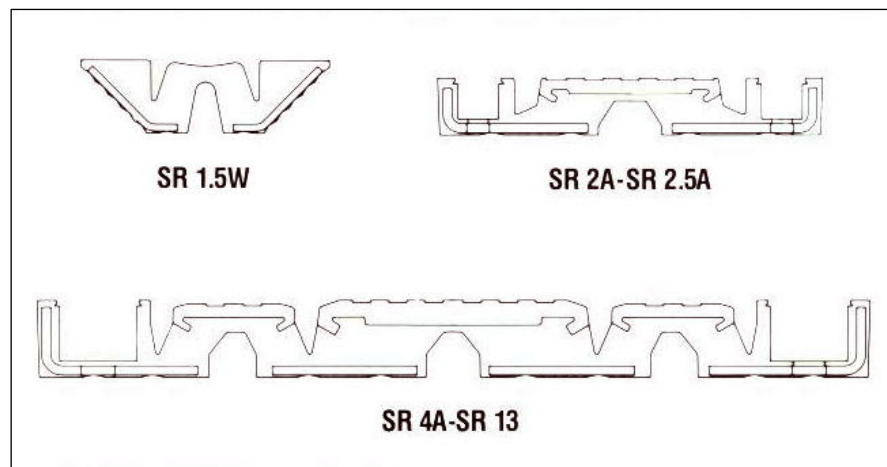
Molded Segmental Expansion Joint Cross Sections
